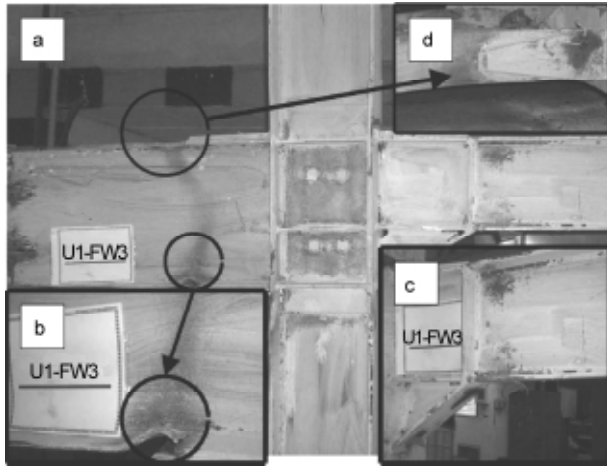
(a) Specimen U1-FW3 erected after the experiment (rear view) (b) deep beam bottom flange fracture (rear view) (c) flaking of whitewashed area at shallow beam (rear view) (d) flaking of whitewashed area at deep beam top flange beyond the coverplate (top view).
